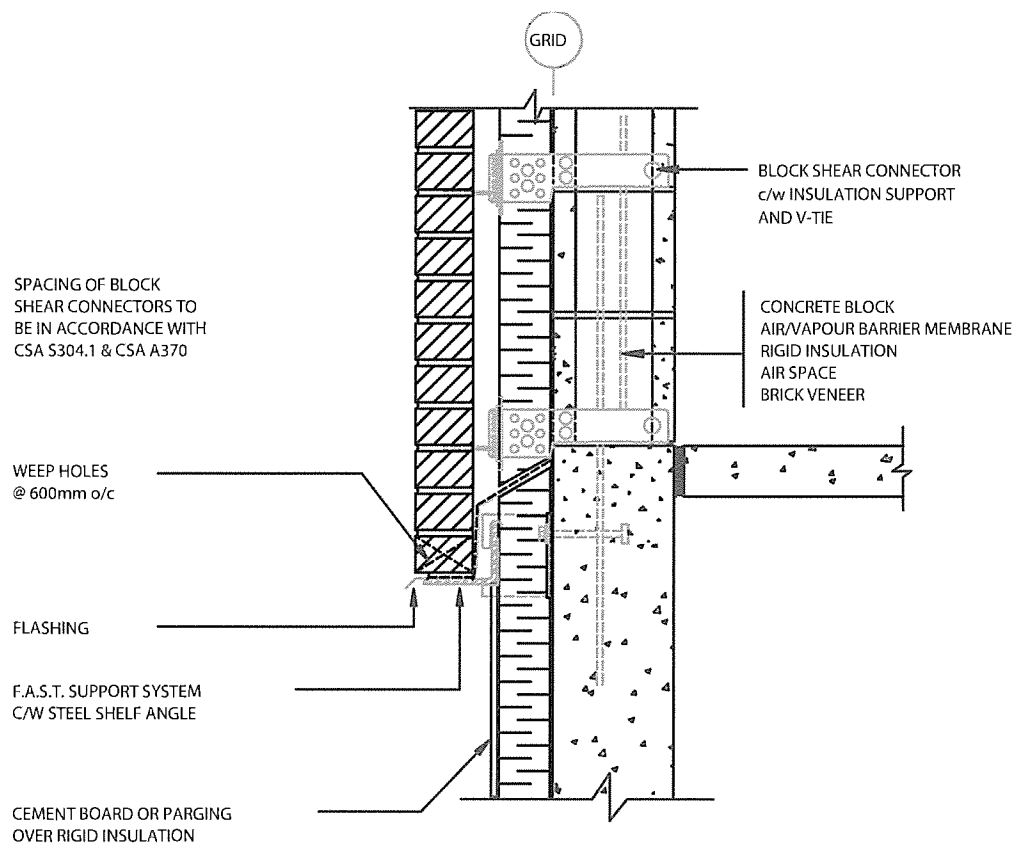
BRICK VENEER / CONCRETE BLOCK - AT FOUNDATION
